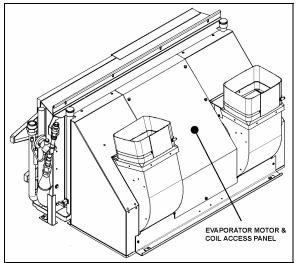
EVAPORATOR COIL ACCESS PANEL
